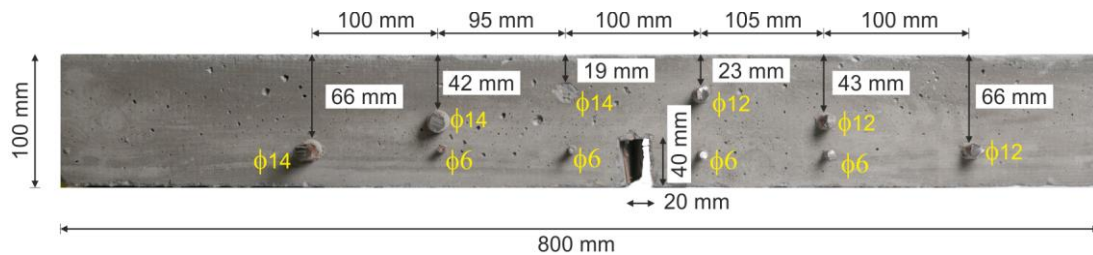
Photograph of reinforced concrete specimen with dimensions and positions of steel bars
